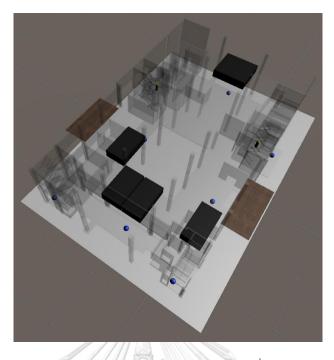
Fire extinguisher installation plan for 2nd floor of scenario 1D
